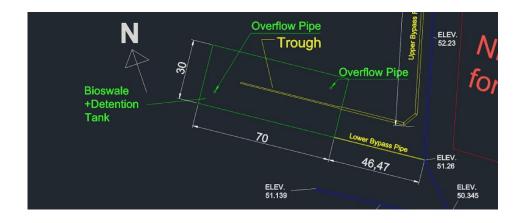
AUTOCAD rendering of bio-retention pond (green) along with bypass pipes and channel/trough (yellow)
